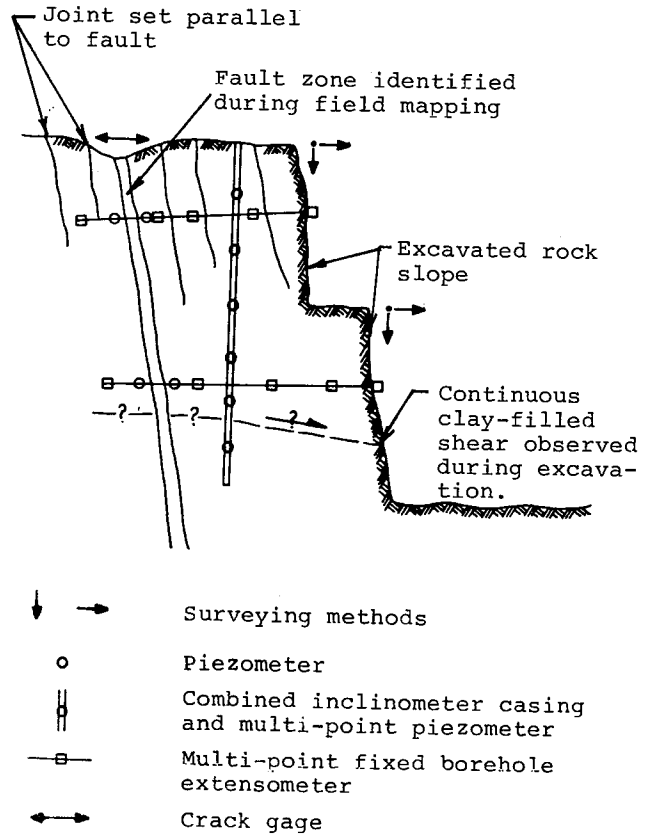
Possible layout of instrumentation for monitoring an excavated slope in rock when there is evidence of instability.
